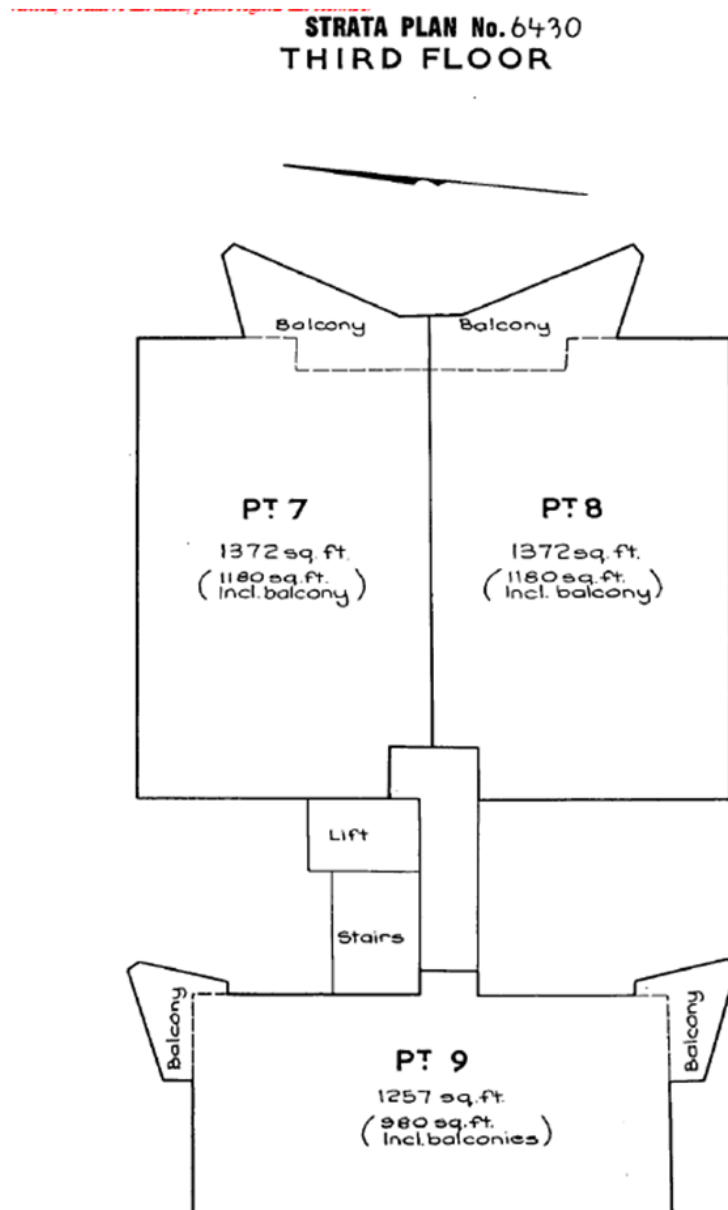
Strata Plan for Level 3 of 33 Malvern Avenue. Note that photos were taken from Pt 8 Balcony.
